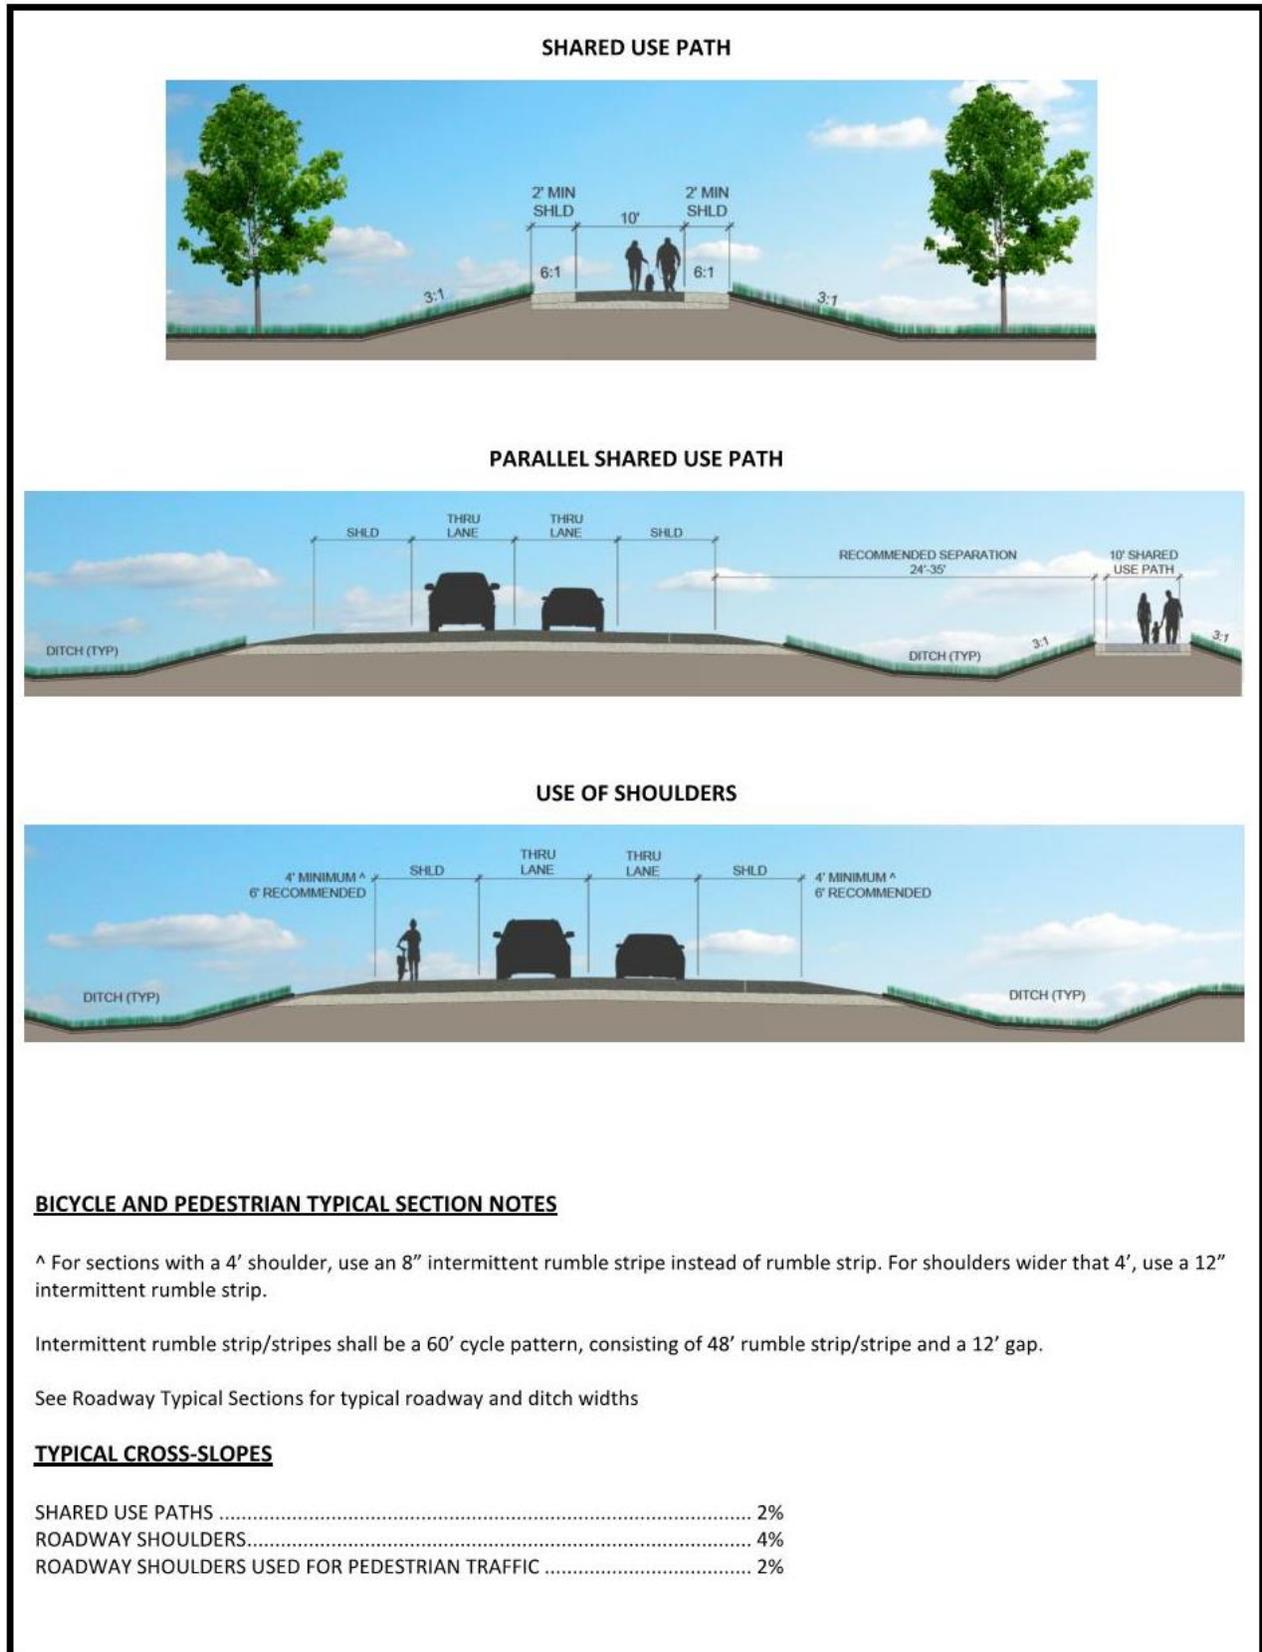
Typical Multi-Modal Facility Cross-Sections
